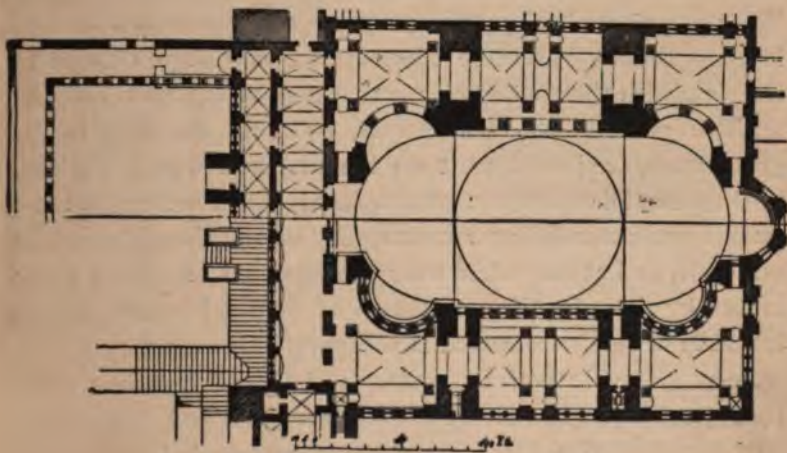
Ground-Plan of the Church of Santa Sophia.
